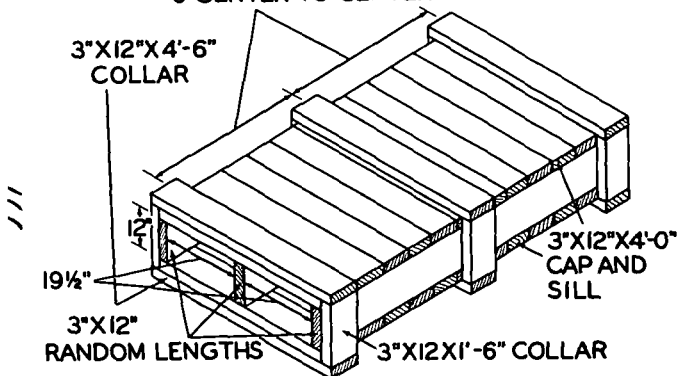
Timber box culvert, 19 1/2- by 12-inch.
